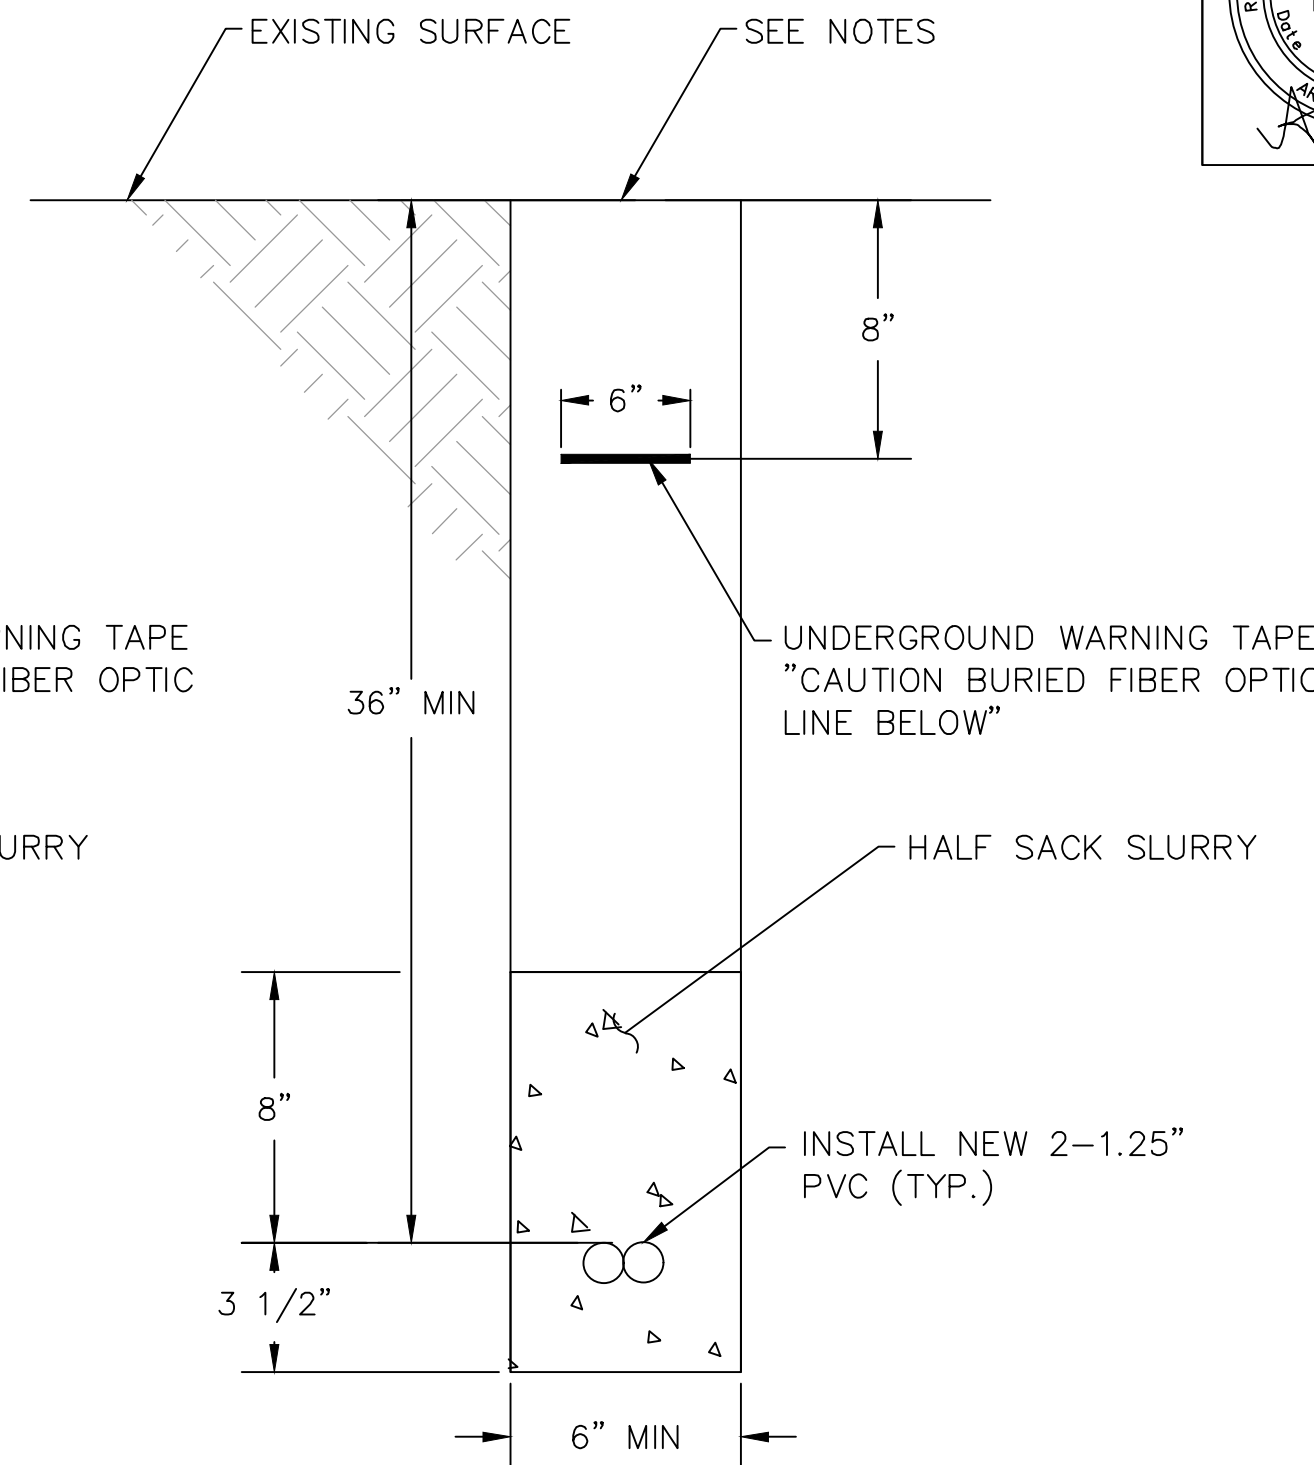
DETAIL A (FOR EXISTING CONDUIT WITH EXISTING FIBER)
